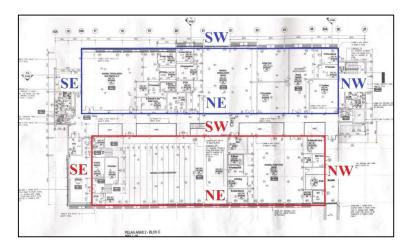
FPTV (Block C) - Floor Plan Drawing (Second Floor)
